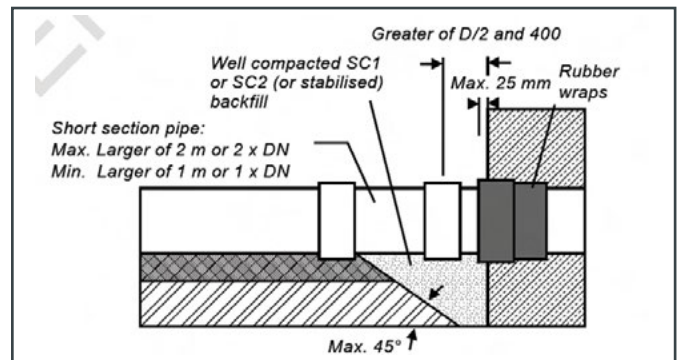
GRP Pipe connection to a rigid structure, Flowtite Installation Guide.
